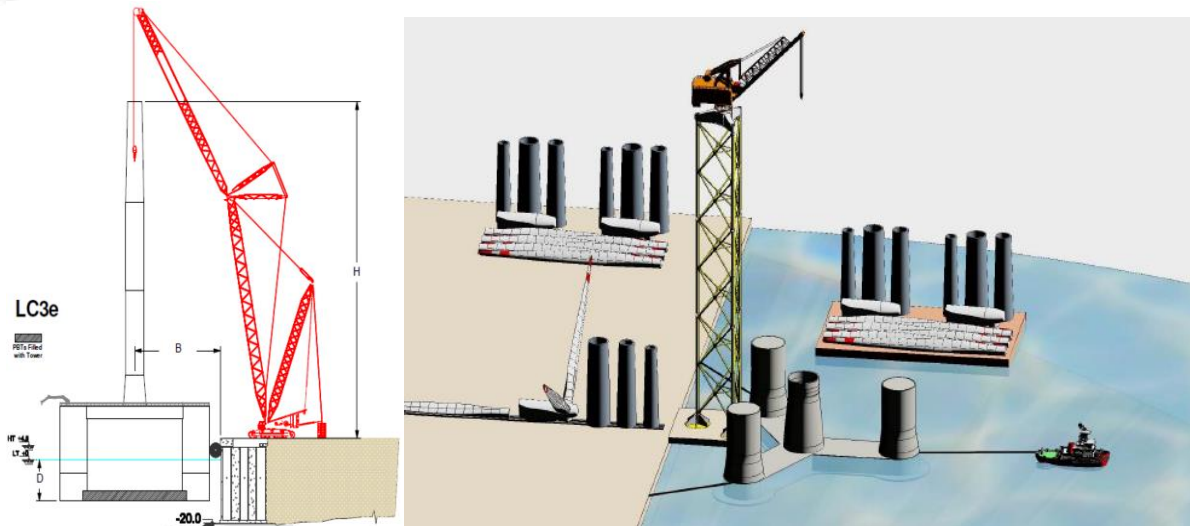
Left: Schematic assembly of wind turbine tower [NAUTILUS]; Right: Illustration of exemplary wind turbine assembly at quay side [OLAV OLSEN].
